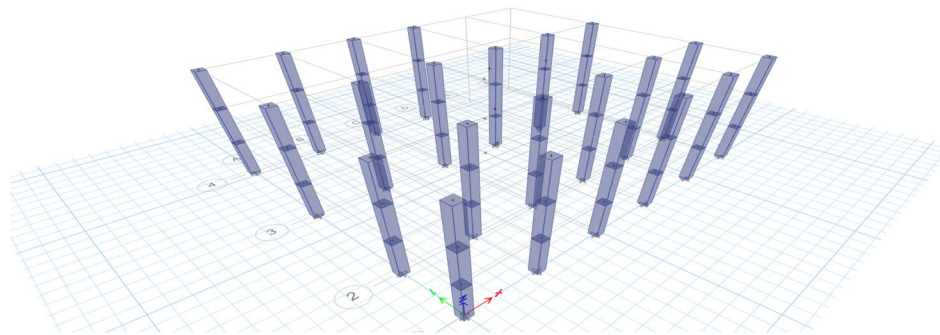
3D View of the Column Grid Layout (G+2 Structure)
